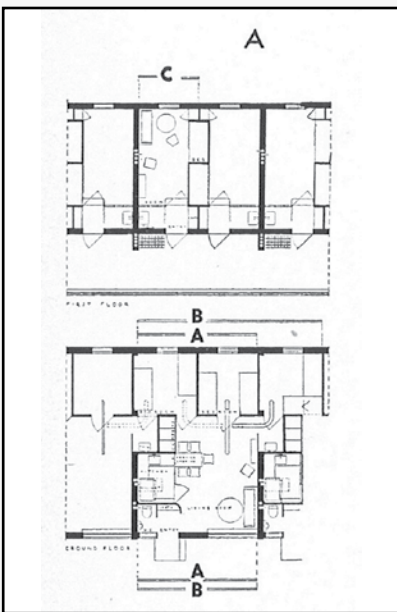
A diagram of the floor plan for the workers' apartment building at Paimio Sanatorium appeared in *Rationelle Bauungsweisen* publication. Giedion 1931c, sheet 13.
